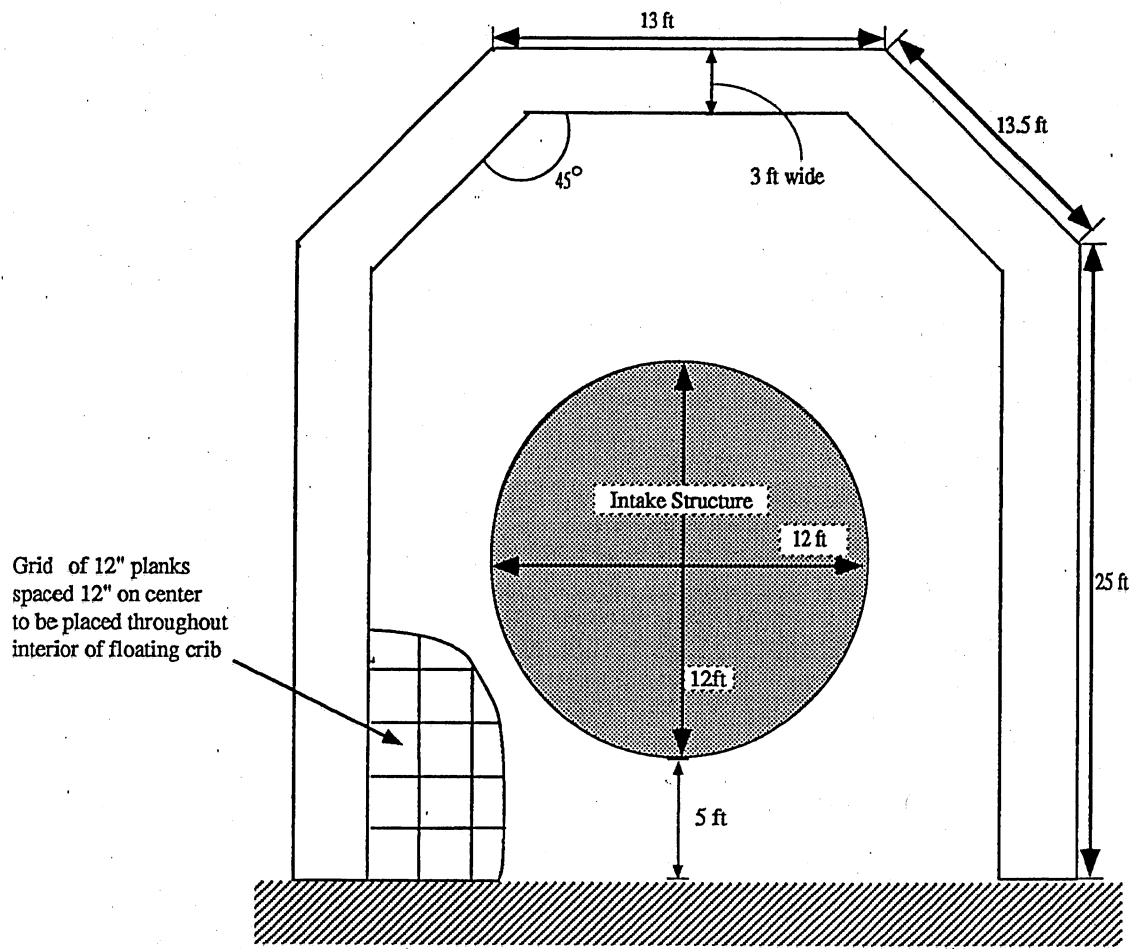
Plan and section view of floating crib and anti-vortex grid.
